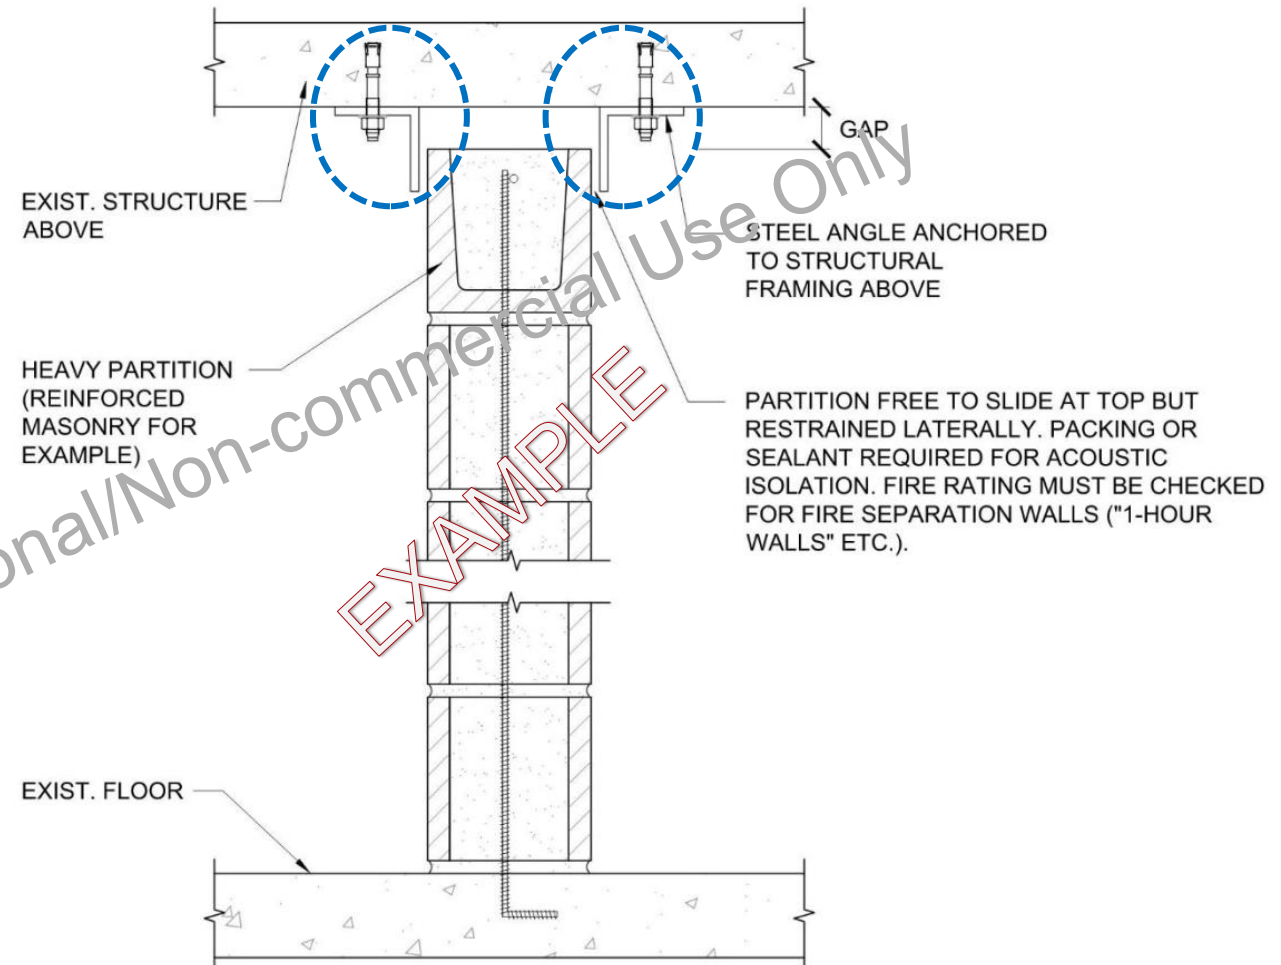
Out-of-plane bracing of existing full height heavy partition wall
